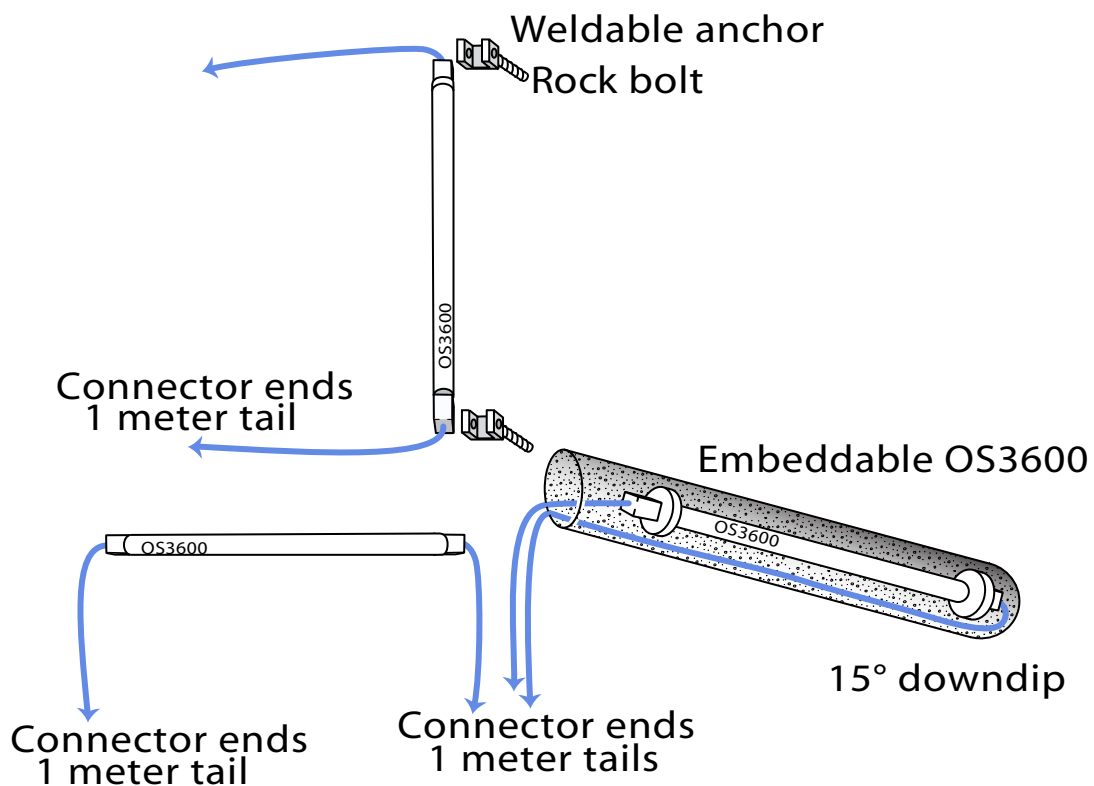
Drawing of OS3600 FBG triplet configuration. The two surface-mounted gages are oriented vertically and horizontally. Their anchors sit in metal u-shaped brackets welded to the heads of two rock bolts. The embedded sensor is grouted into a hole drilled 10-15° downdip. The embedded sensors have 5-cm diameter metal disks on each end.
